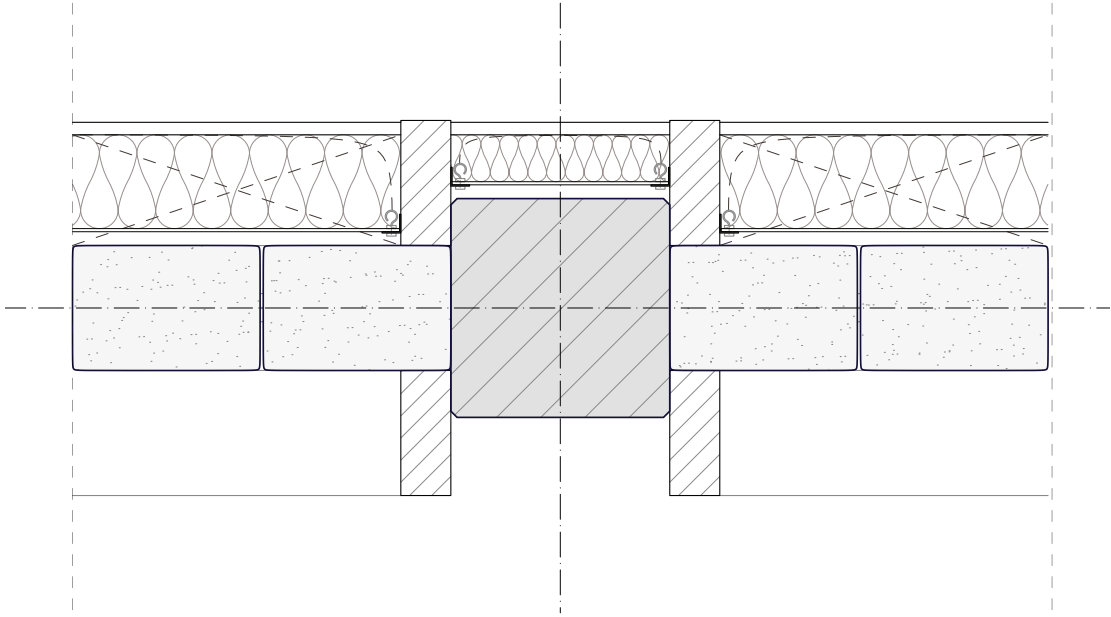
| Detail A. New wall: existing concrete column, timber framework, rammed demolition waste blocks, metal mesh, reed insulation, loam finish
